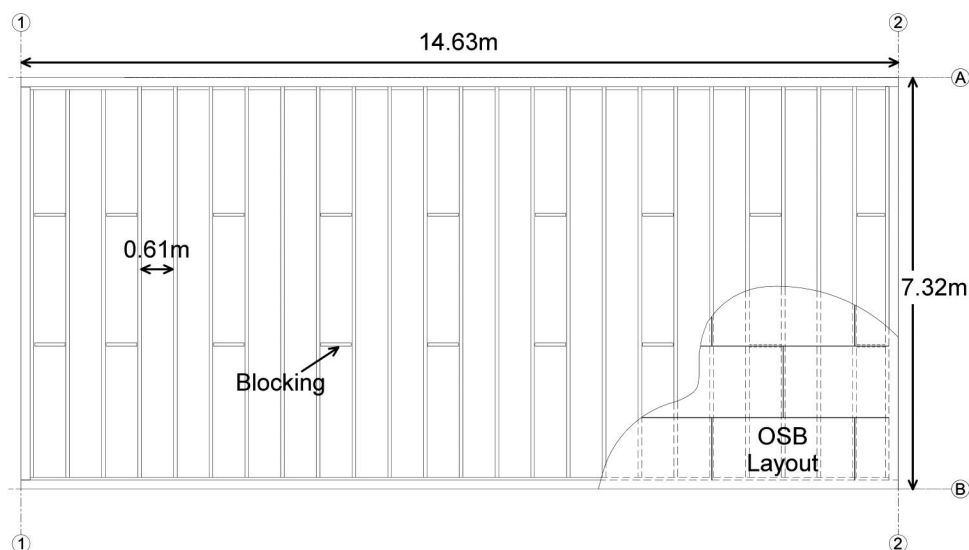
Simplified floor system plan showing overall dimensions, joist spacing, ledger/header locations, blocking, and OSB sheathing layout
